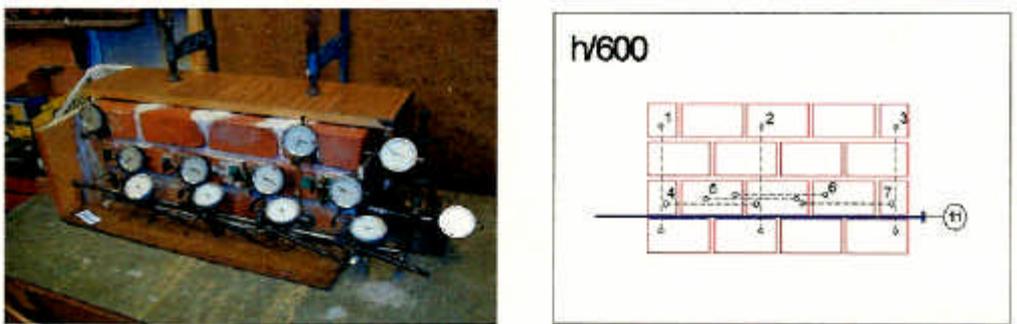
Scheme of tests arrangement within the reinforcement anchorage in masonry
